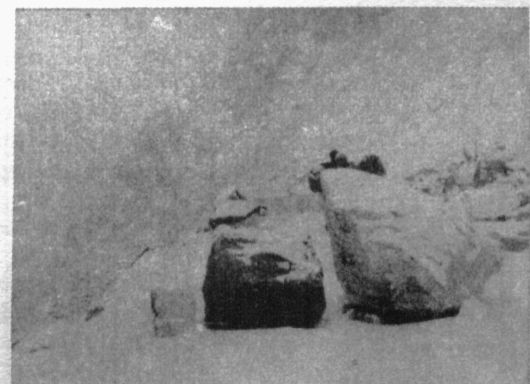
LARGE BOULDERS FALLEN ON ROAD PAVEMENT. PART OF THE ROAD DAMAGED DUE TO LANDSLIDE IS SEEN IN THE BACKGROUND
